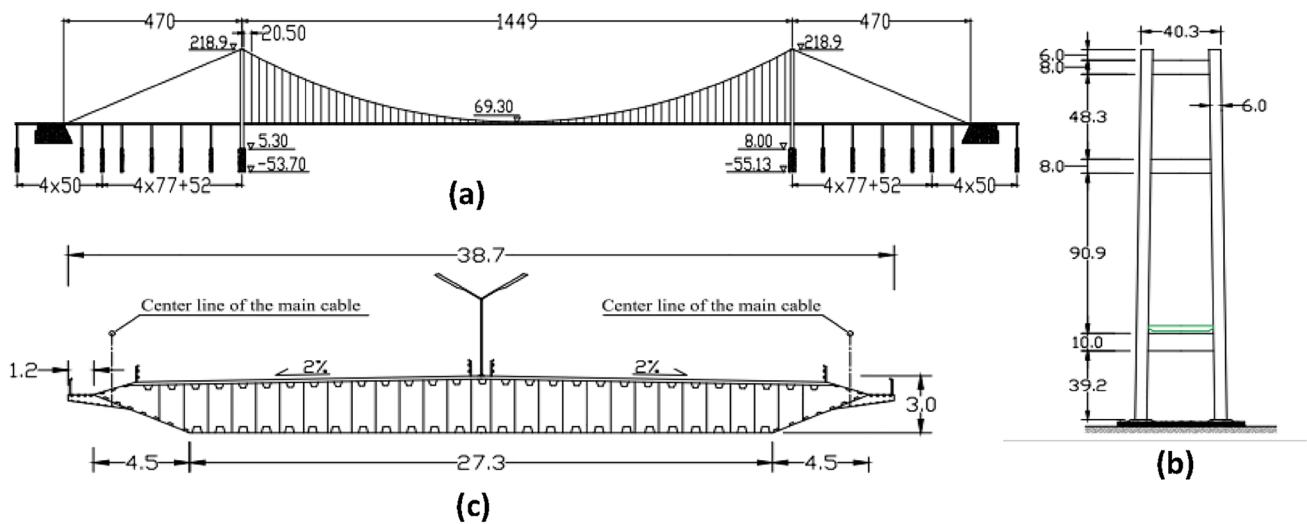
RSB a elevation. b Geometry of the tower. c Cross-section girder. (Dimensions in m)
